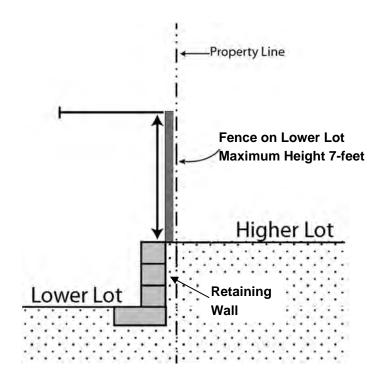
Measurement of Retaining Wall and Fence Located on Lower Lot
